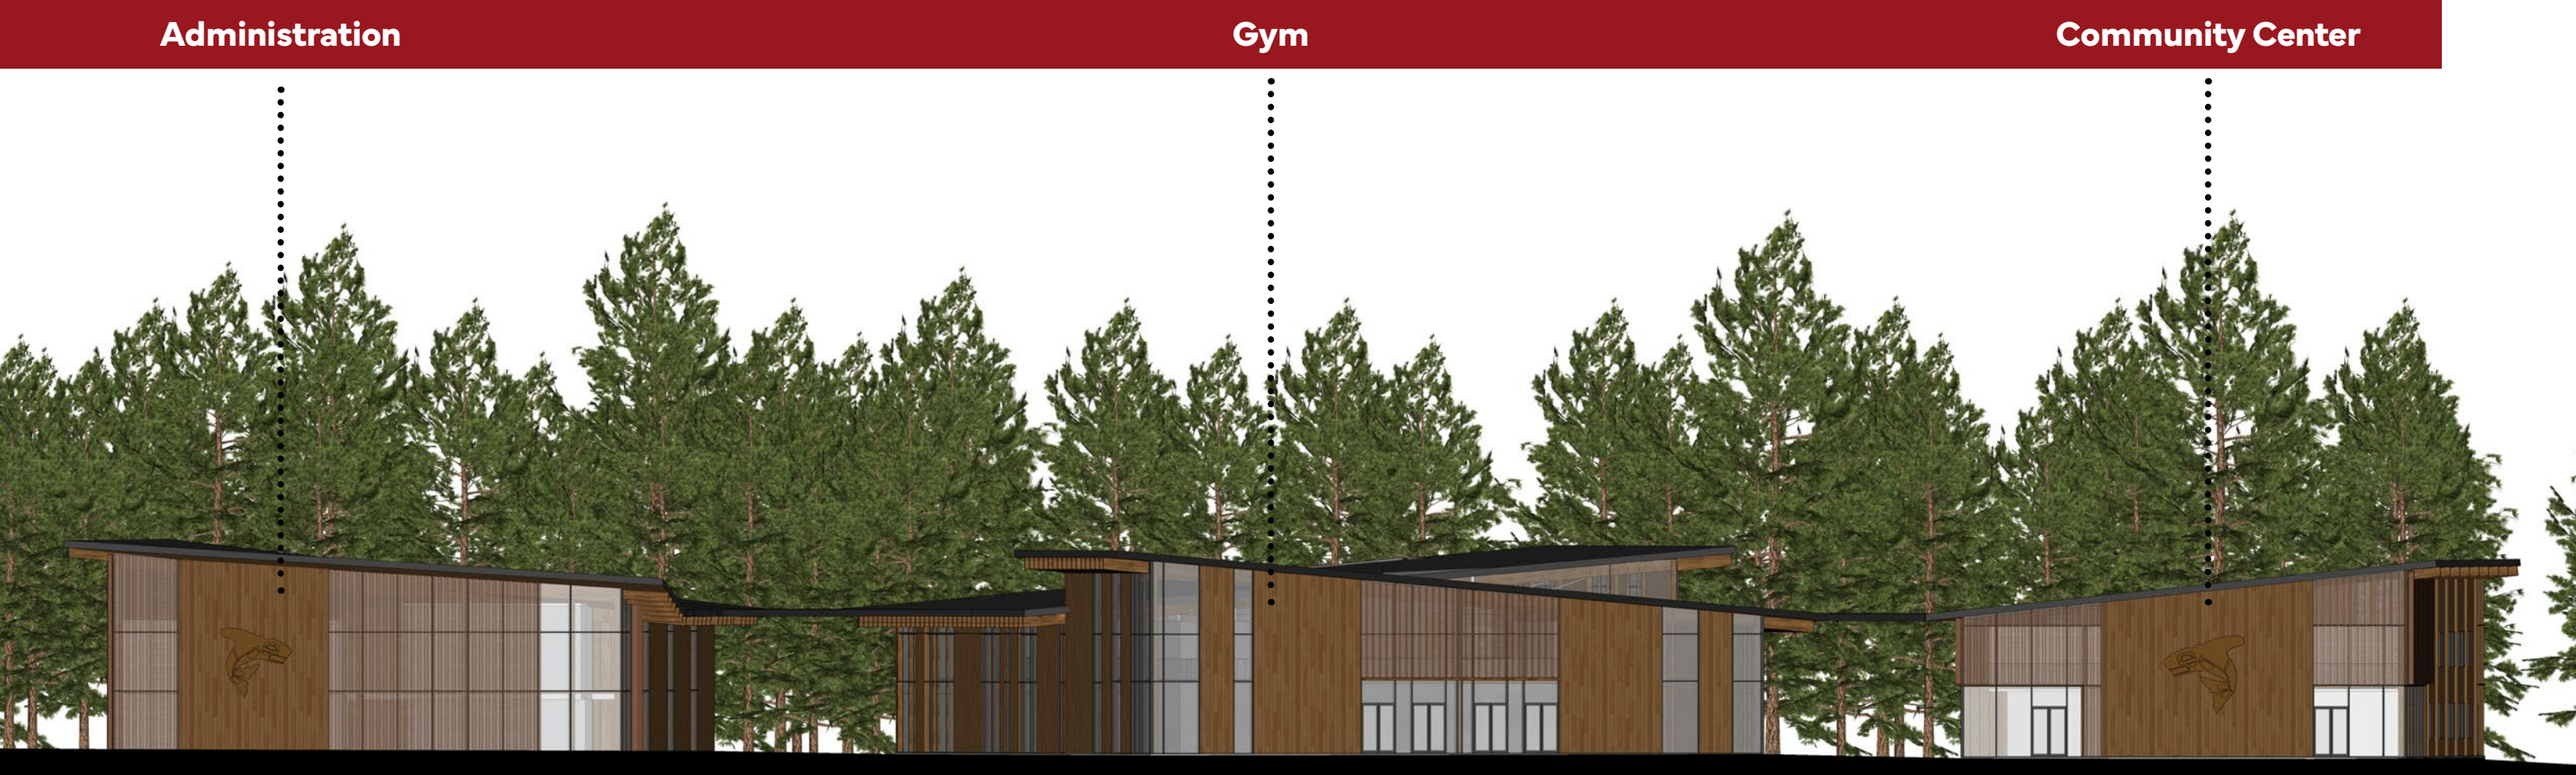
EAST TO WEST BUILDING ELEVATION
